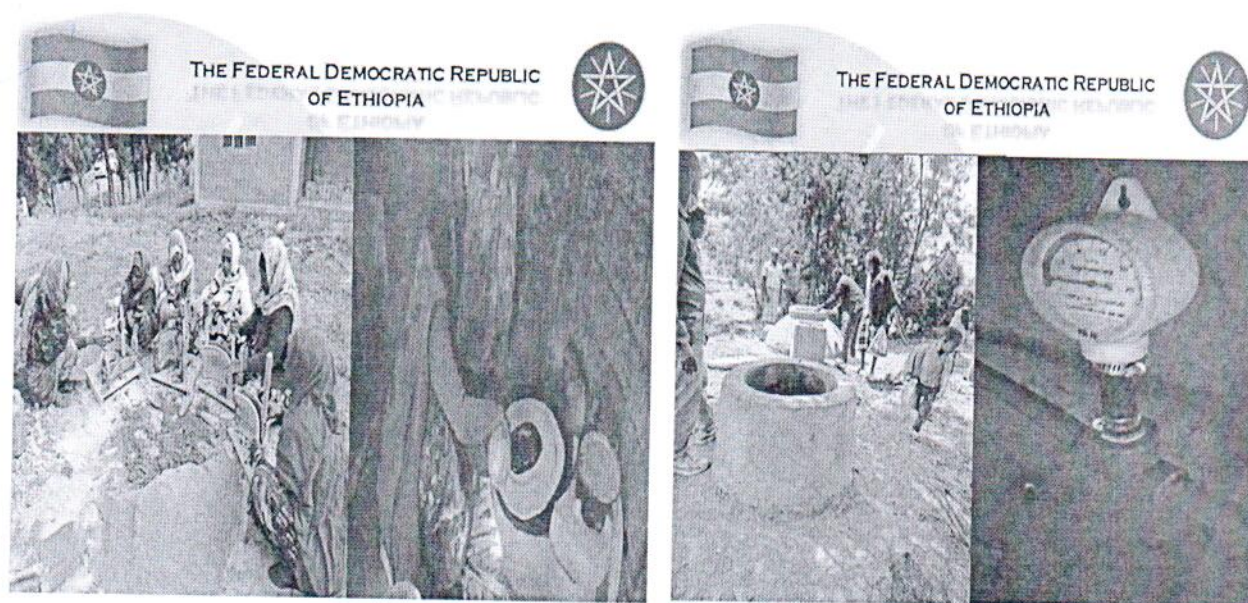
Fuel saving stove and biogas plant construction in Doba woreda
